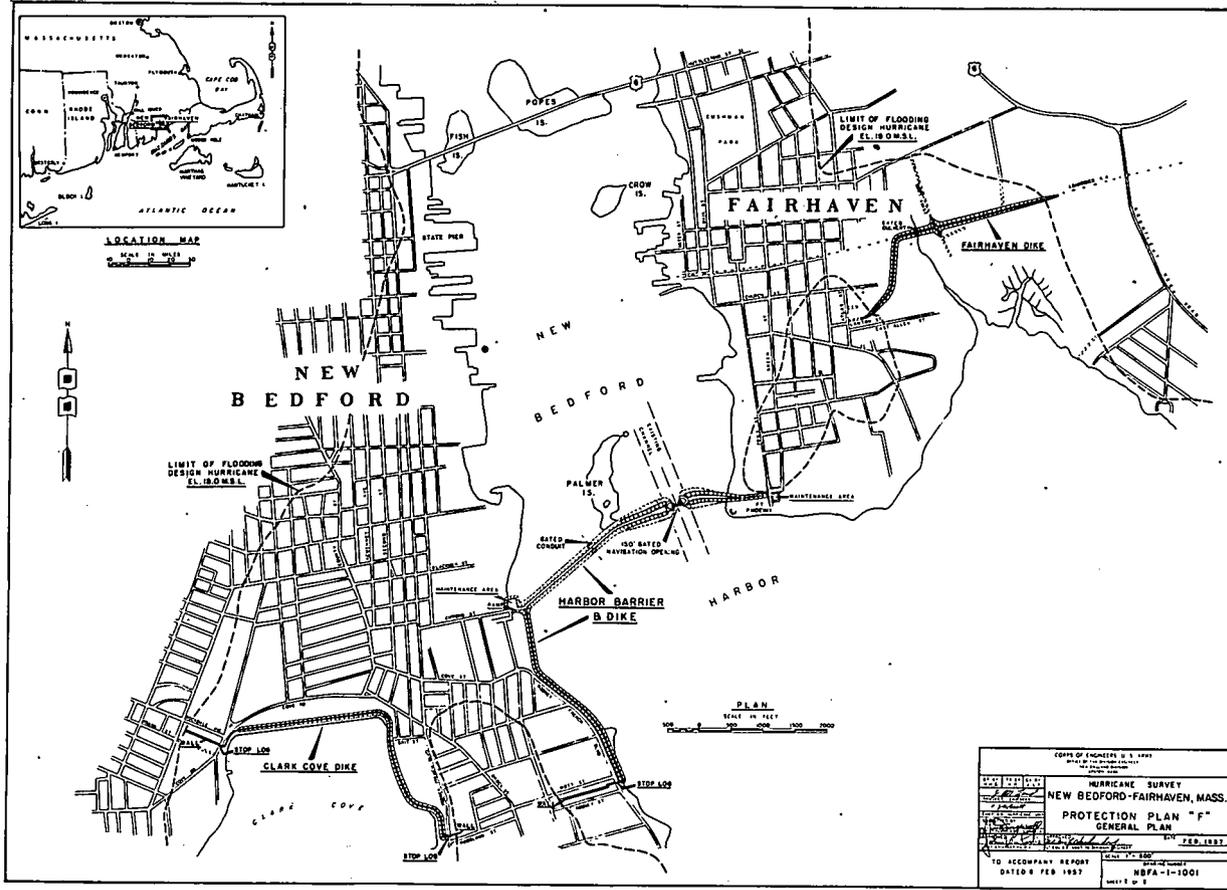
PROTECTION PLAN "F", NEW BEDFORD-FAIRHAVEN, MASS.
